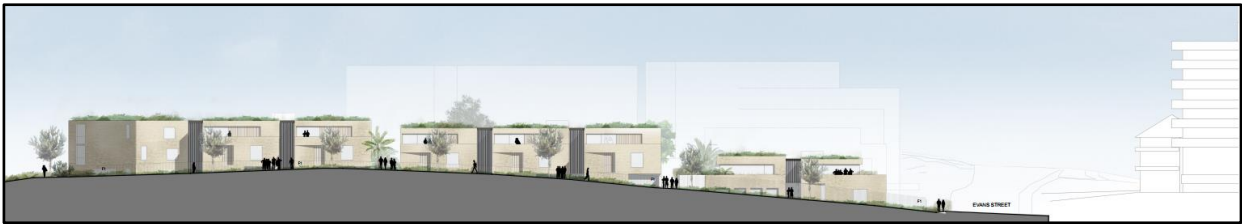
CARRINGTON PARADE – PROPOSED ELEVATION
